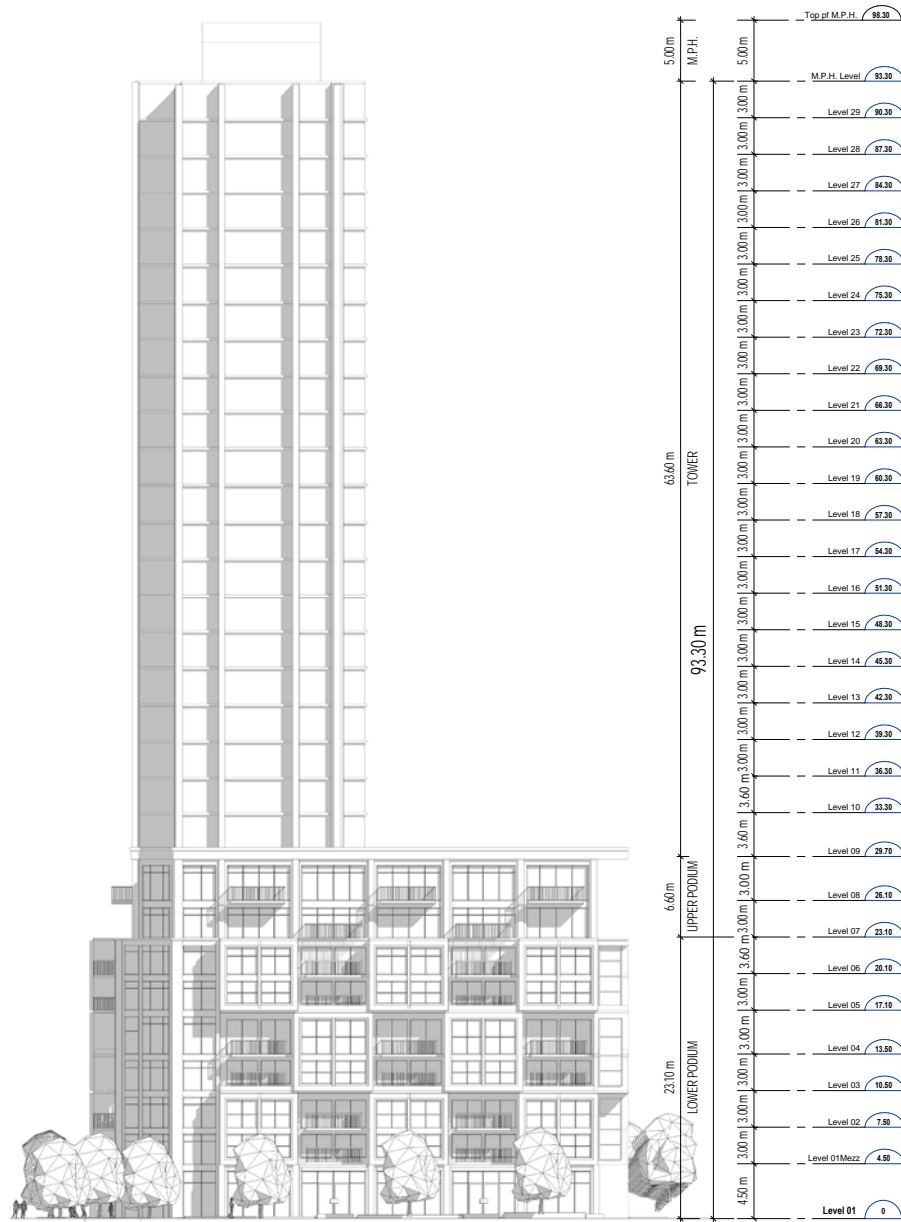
East Elevation (Prepared by Sweeny & Co Architects Inc.)
